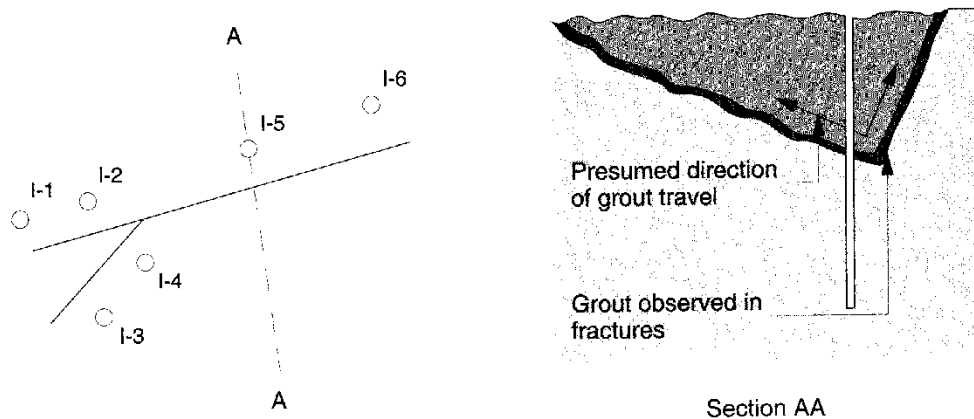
Extent of grout movement traced after the careful excavation of the rock around injection hole I-5.
